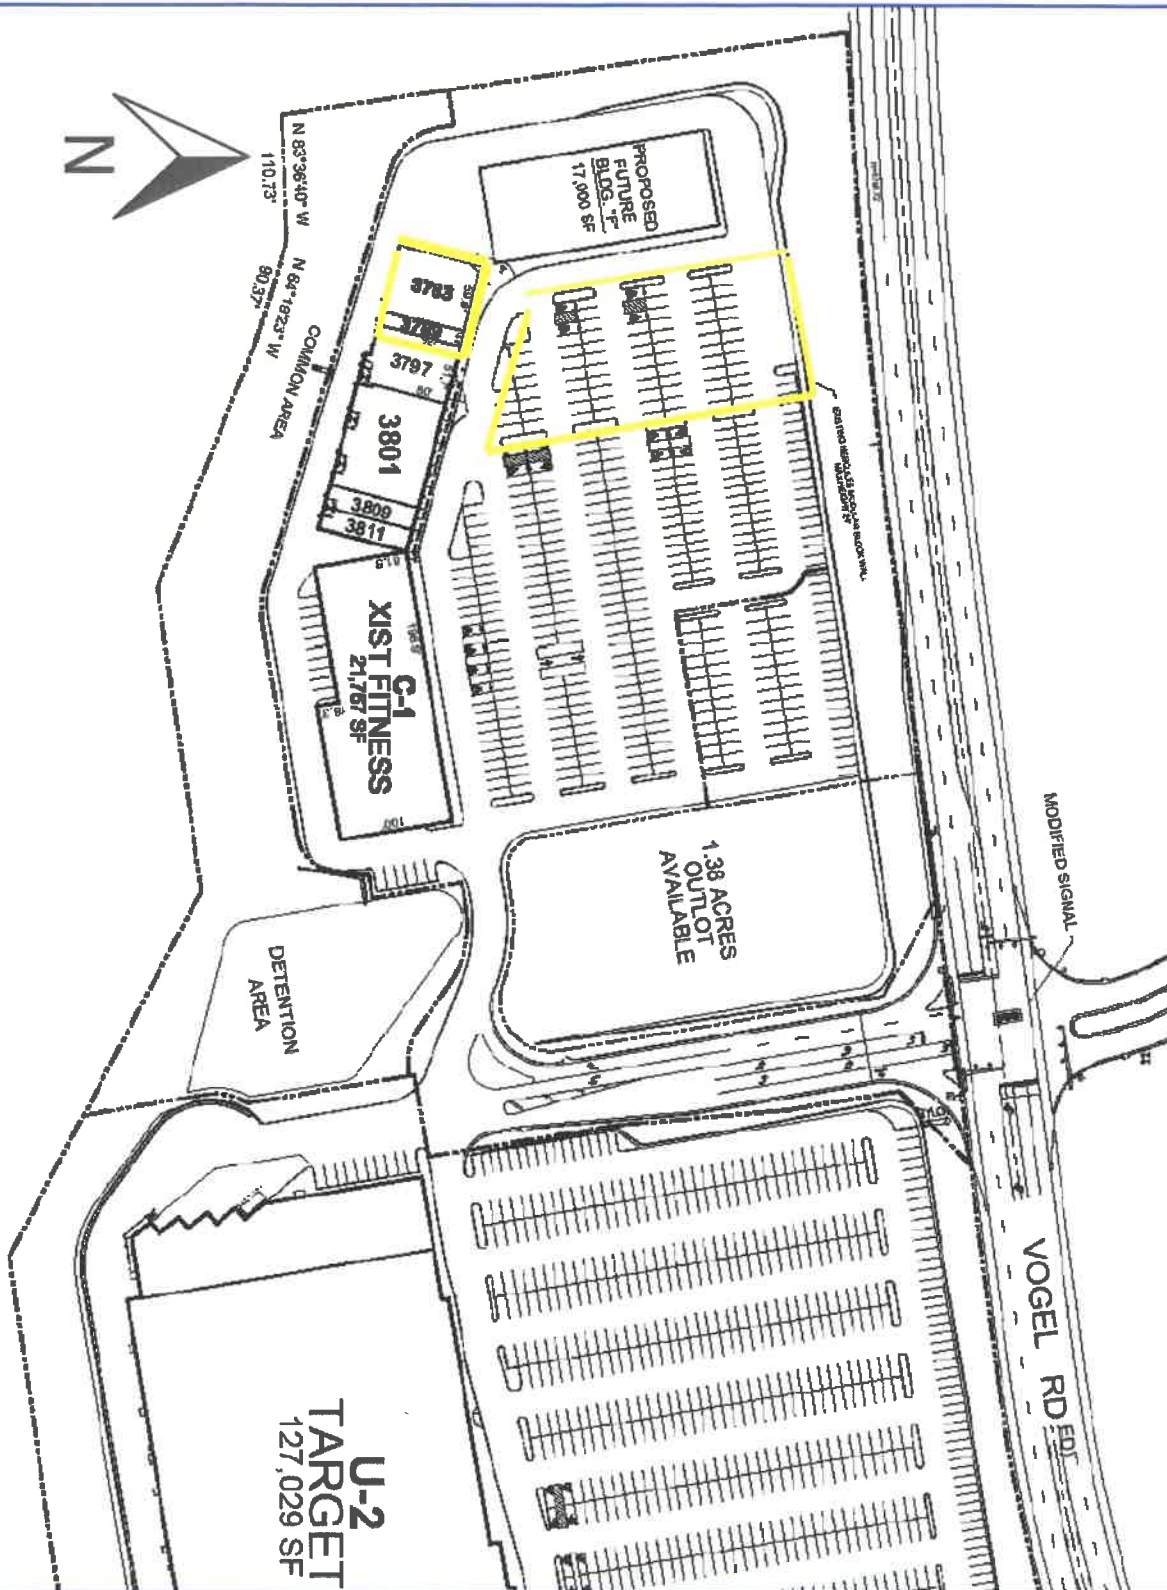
EXHIBIT B: SITE PLAN OF PROPOSED LOCATION
